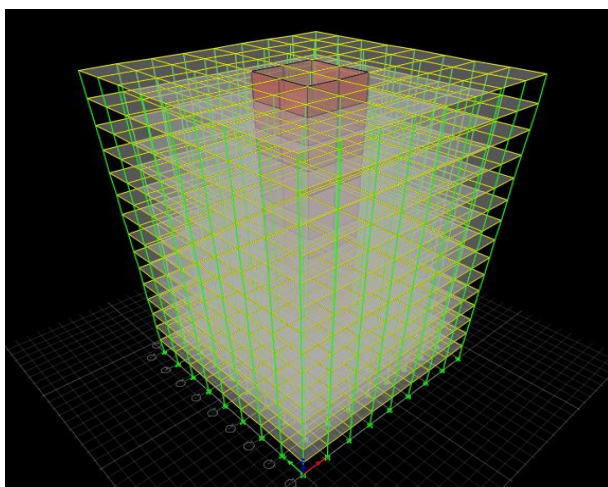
3D view of model with Shear Wall Position-5 (SWP-5)
